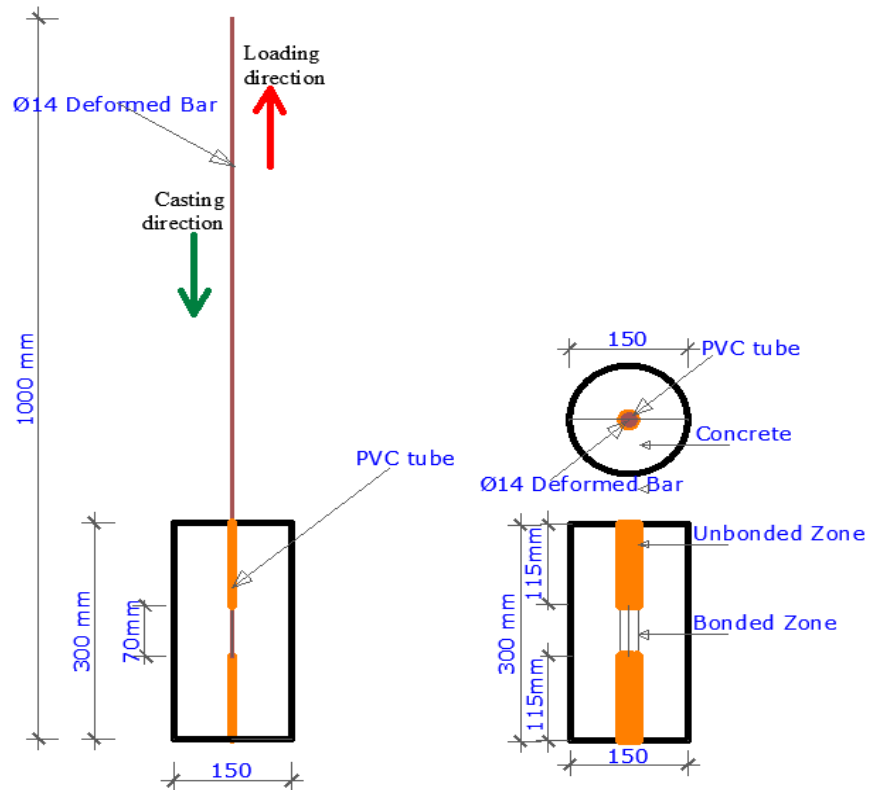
(b) Pull-out Specimens test details Ø14 mm,  $l_d = 70\text{mm}$
